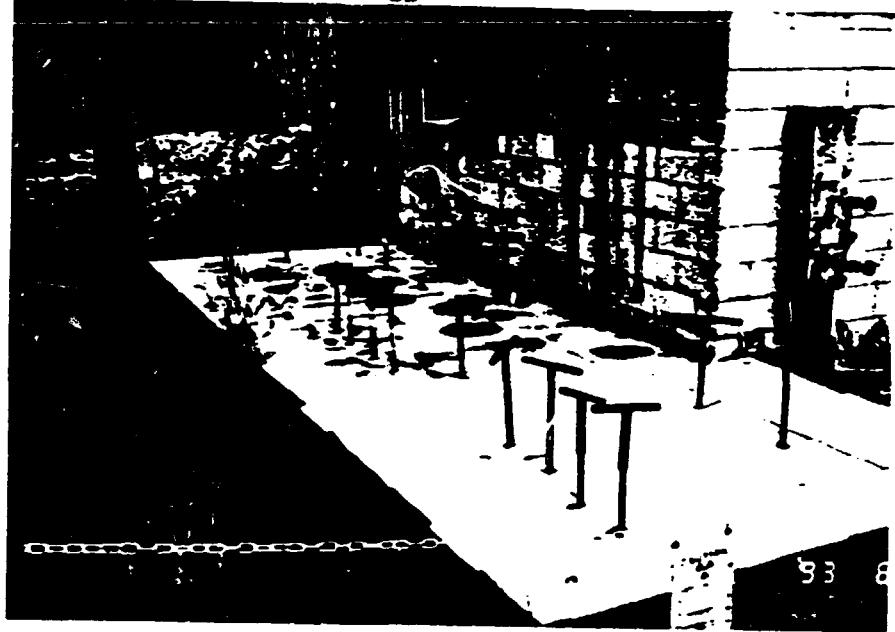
(a). Pump house, southwest corner, overlooking covered (shielded) valve pit.
